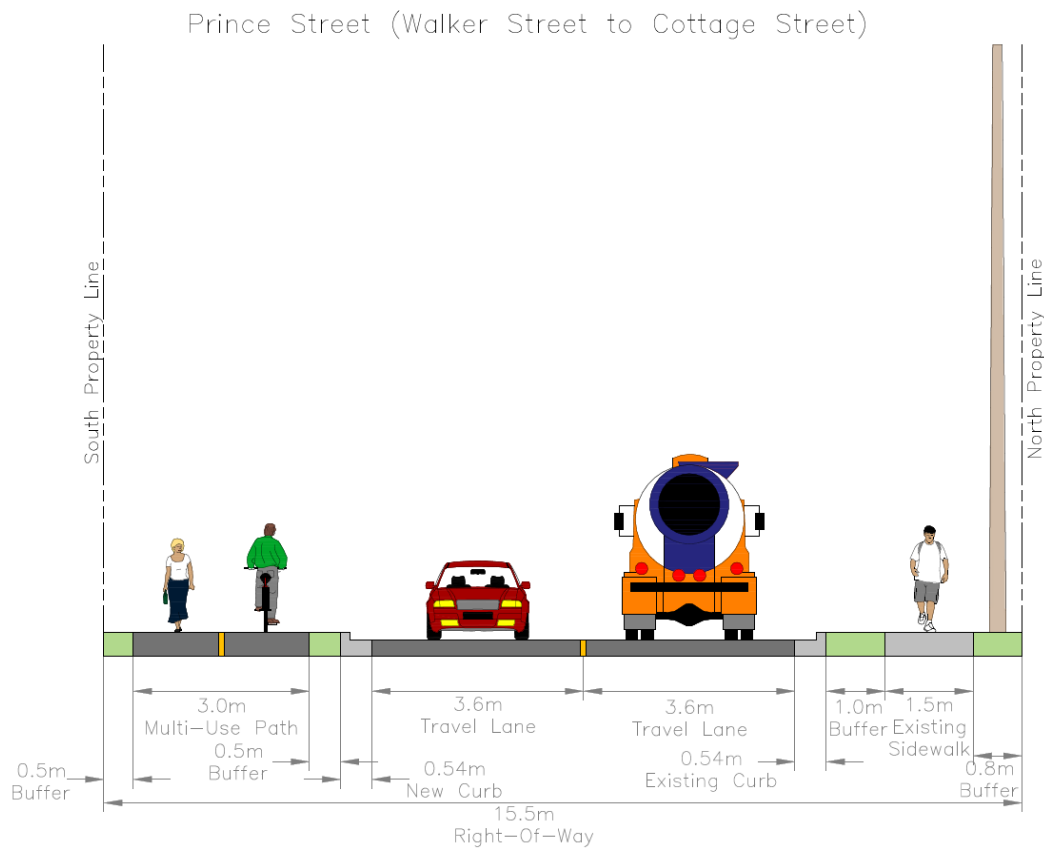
Prince Street between Walker Street and Cottage Street, Revised Cross Section
